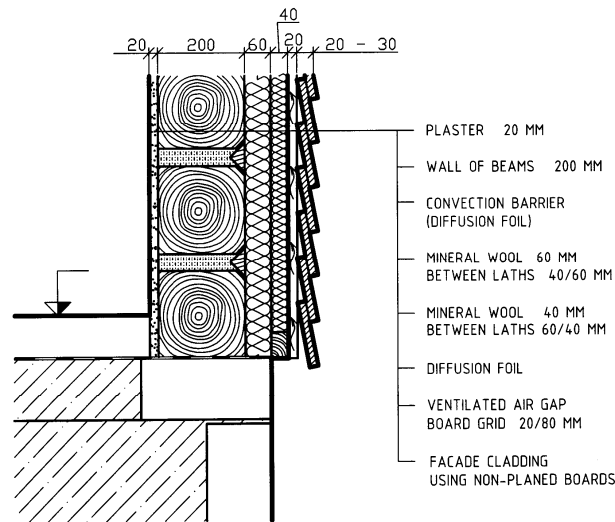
A detail of the thermal insulation of a log wall from exterior (Variant III)
